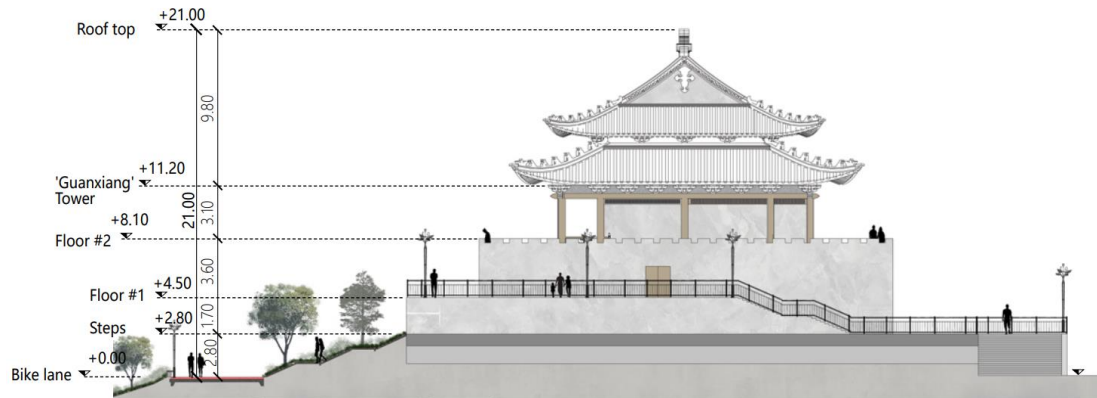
Construction detail of landscape plaza. (Drawn by author)
